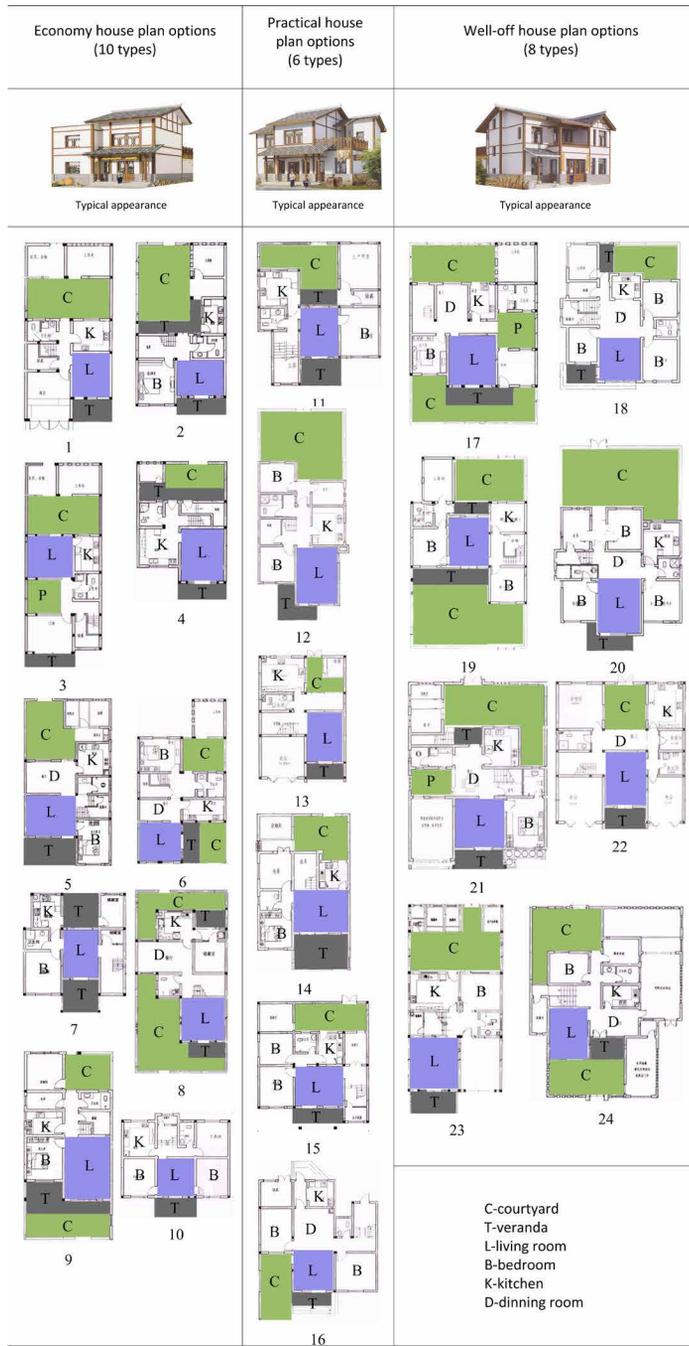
The ground floor plans and typical appearance of the 24 types of dwellings proposed by the local government (CCC, 2011)
